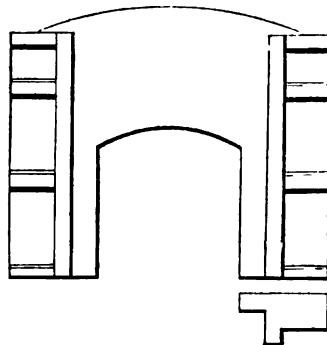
Outside elevation of door-frame, which is made of cast-iron.
